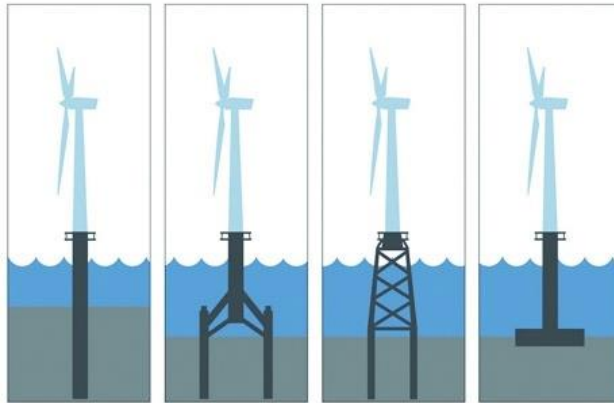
Bottom-fixed foundations - monopile, tripile, jacket, gravity
